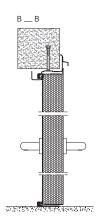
Vertical cross-section of the ECO external seamless steel door with a corner frame without a thermal break
